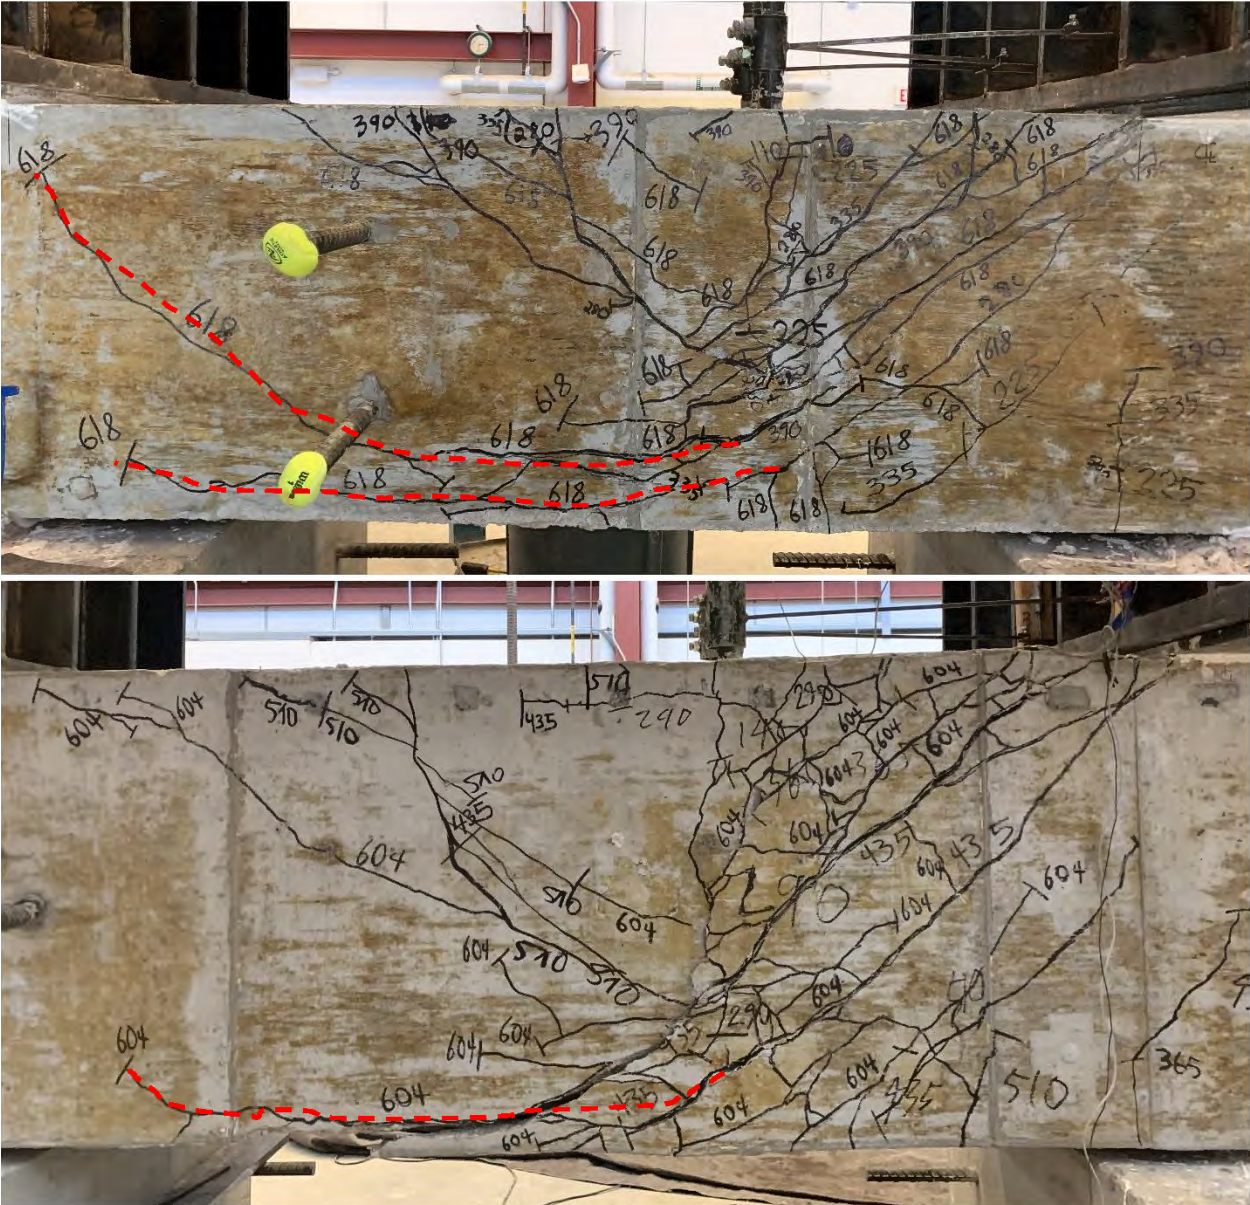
Primarily concrete breakout failure (top: specimen 14-10, bottom: specimen 18-5). (Note: Dashed lines highlight the cracks extending beyond the joint and along the back face of the column or towards the upper bearing member)
